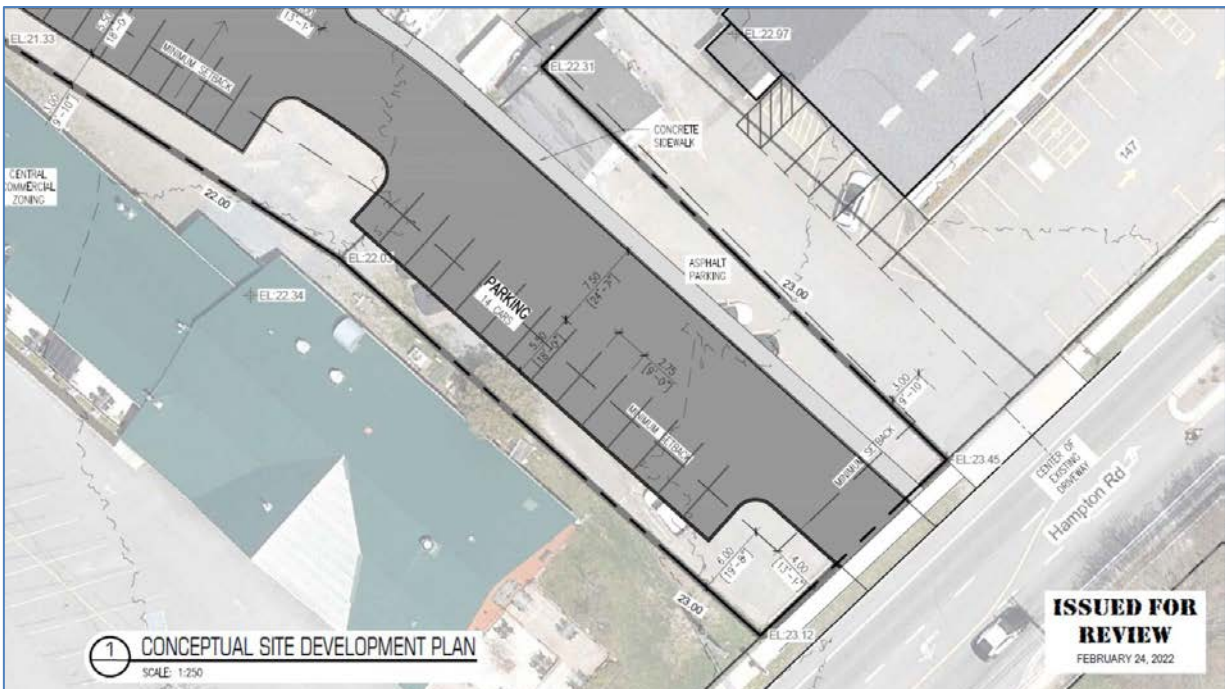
Revised Driveway Entrance with Separation from 147 Hampton Road
